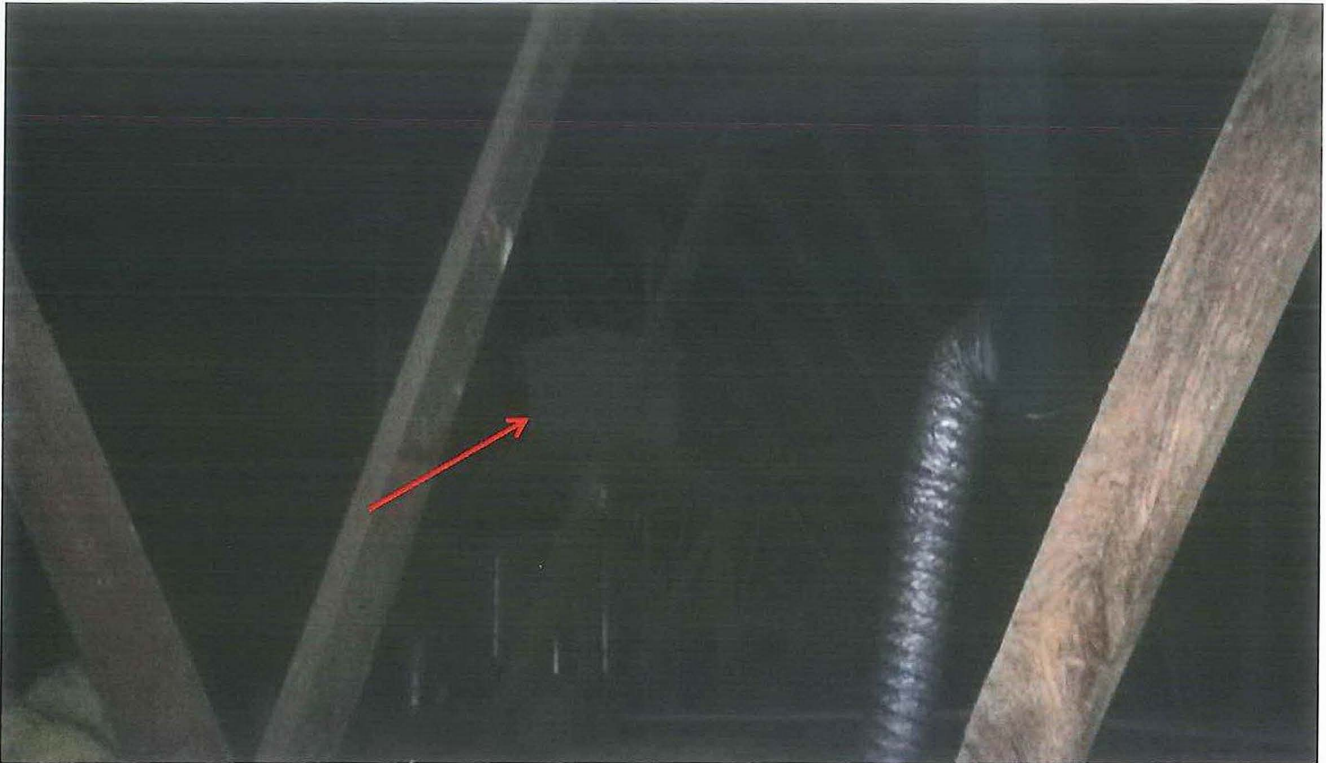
Asset D00081 - Blackheath Hall, Library and Neighbourhood Centre - fibreboard containing asbestos northern perimeter eaves of the KC Bates Hall.
